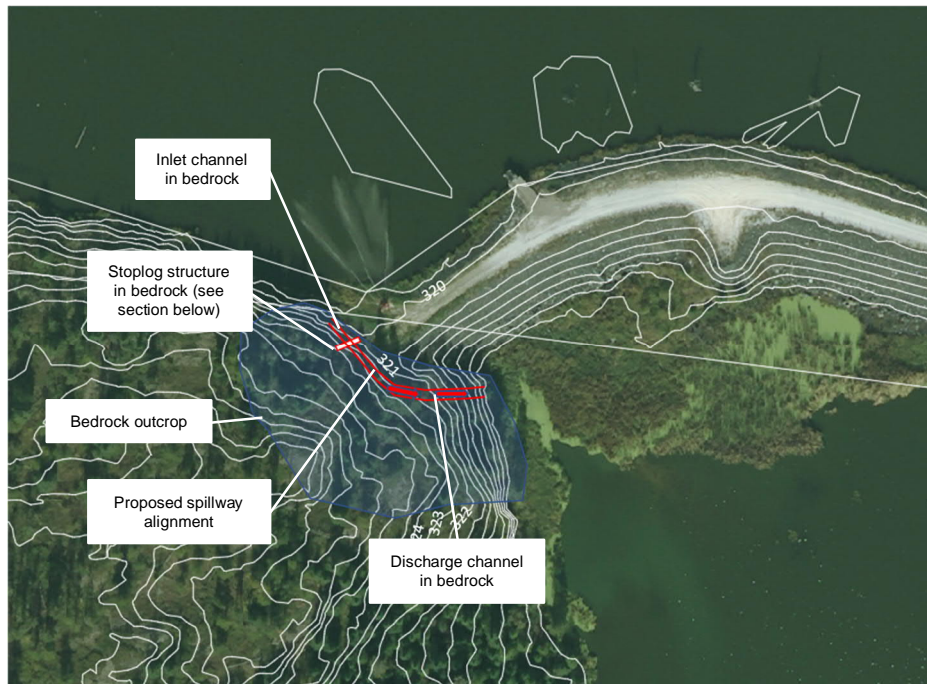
Plan Showing the Proposed Structure Type B and Discharge Channel Through the West Abutment Bedrock Outcrop.
